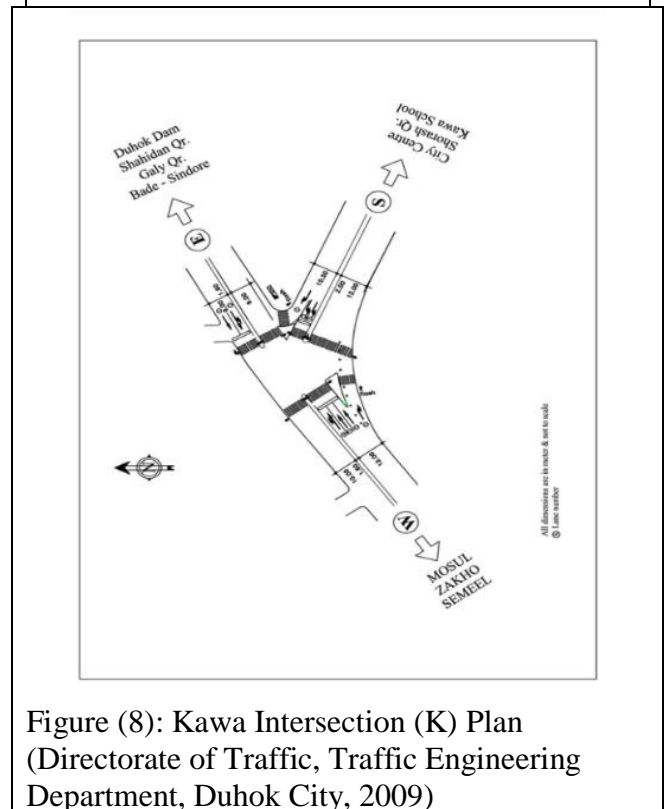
Kawa Intersection (K) Plan (Directorate of Traffic, Traffic Engineering Department, Duhok City, 2009)
